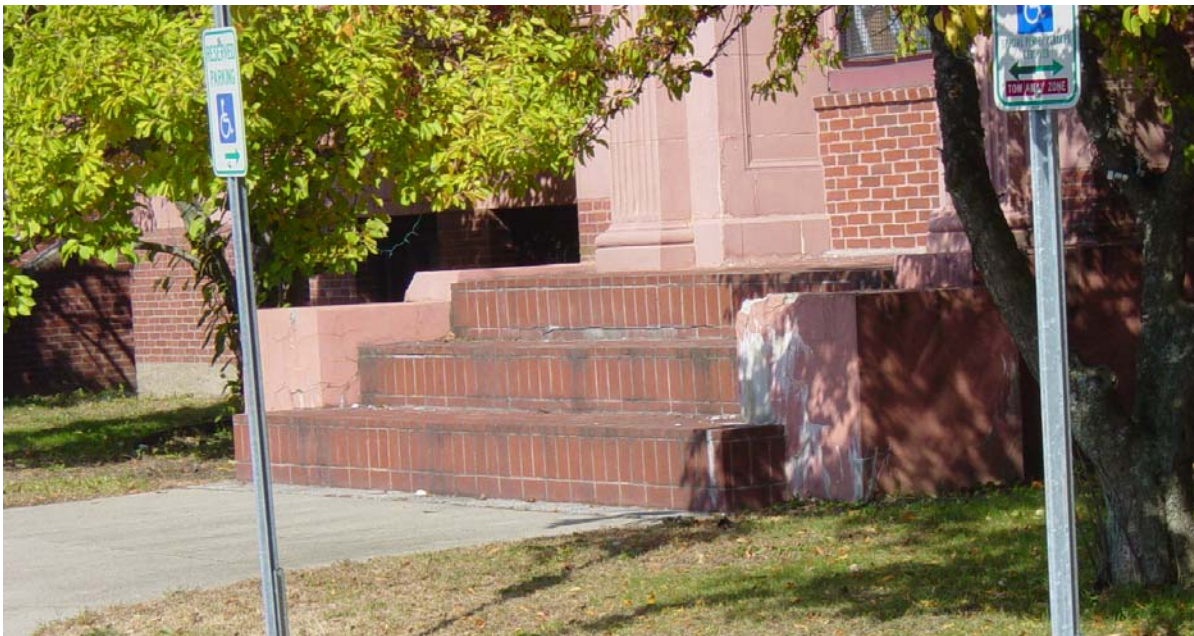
Concrete site walls appears to be in good condition, but application of inexpensive clear penetrating water repellent will extend their life. Brick wall at building is in good condition.
